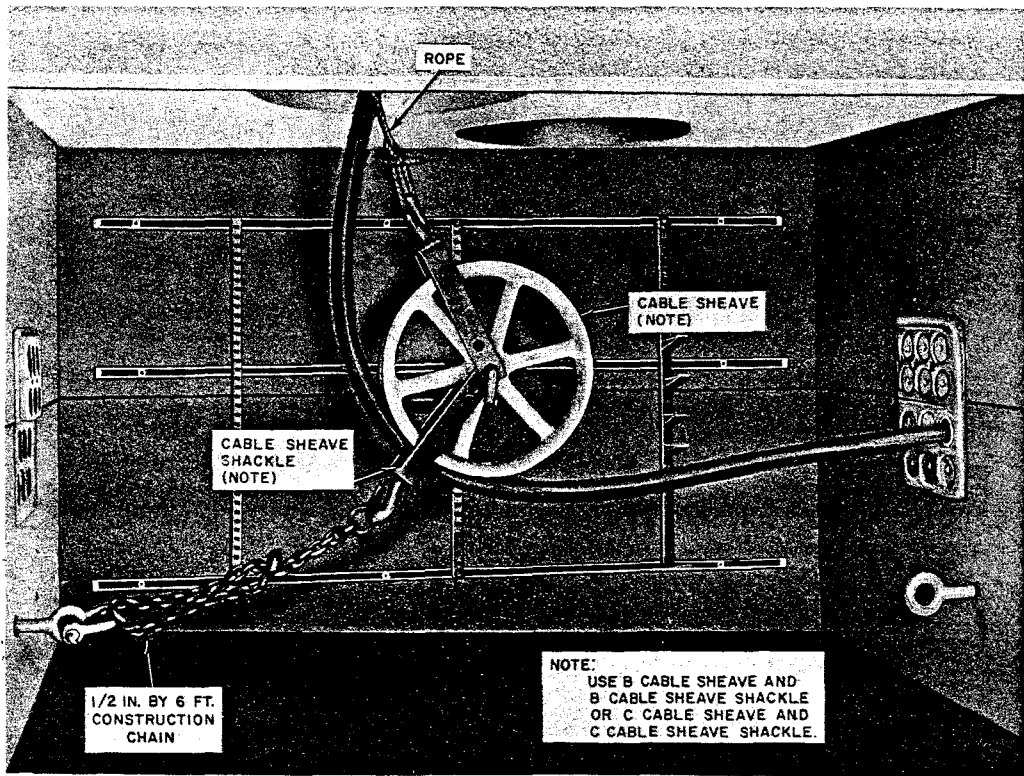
Pulling Arrangement Using Cable Sheave and Cable Sheave Shackle
